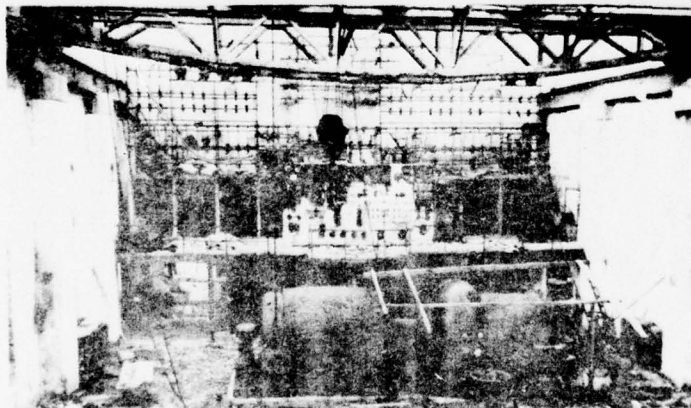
Building 131A. Looking North Showing Turbo-Generator and Burned Out Electrical Panels at North End of Building
